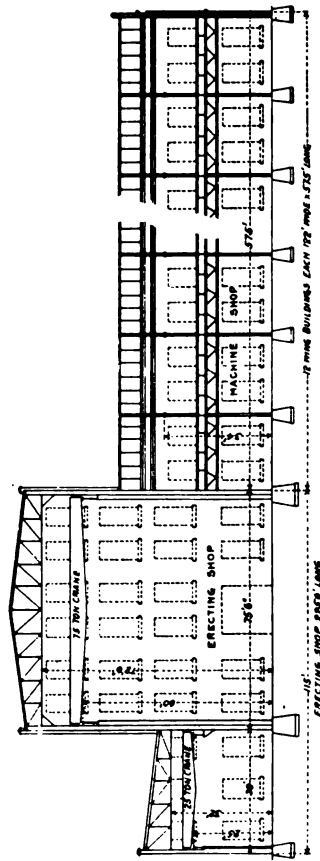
CROSS SECTION OF ERECTING SHOP AND LONGITUDINAL SECTION OF MACHINE SHOP, ALLIS-CHALMERS COMPANY, MILWAUKEE, WIS.
